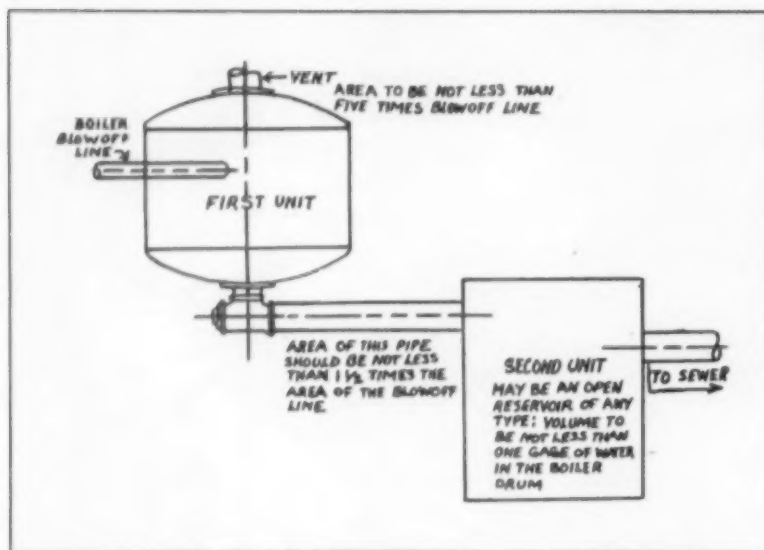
Stripped-down blowoff tank showing four fundamental pipe connections: inlet (blowoff 1-inch line); vent, outlet, drain pipe
